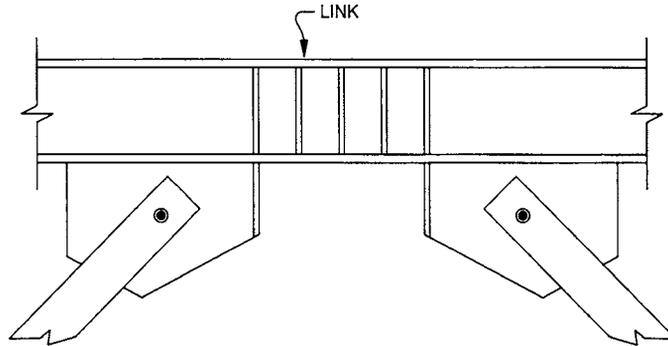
Typical connection details and stiffener arrangement for an eccentric braced frame.
